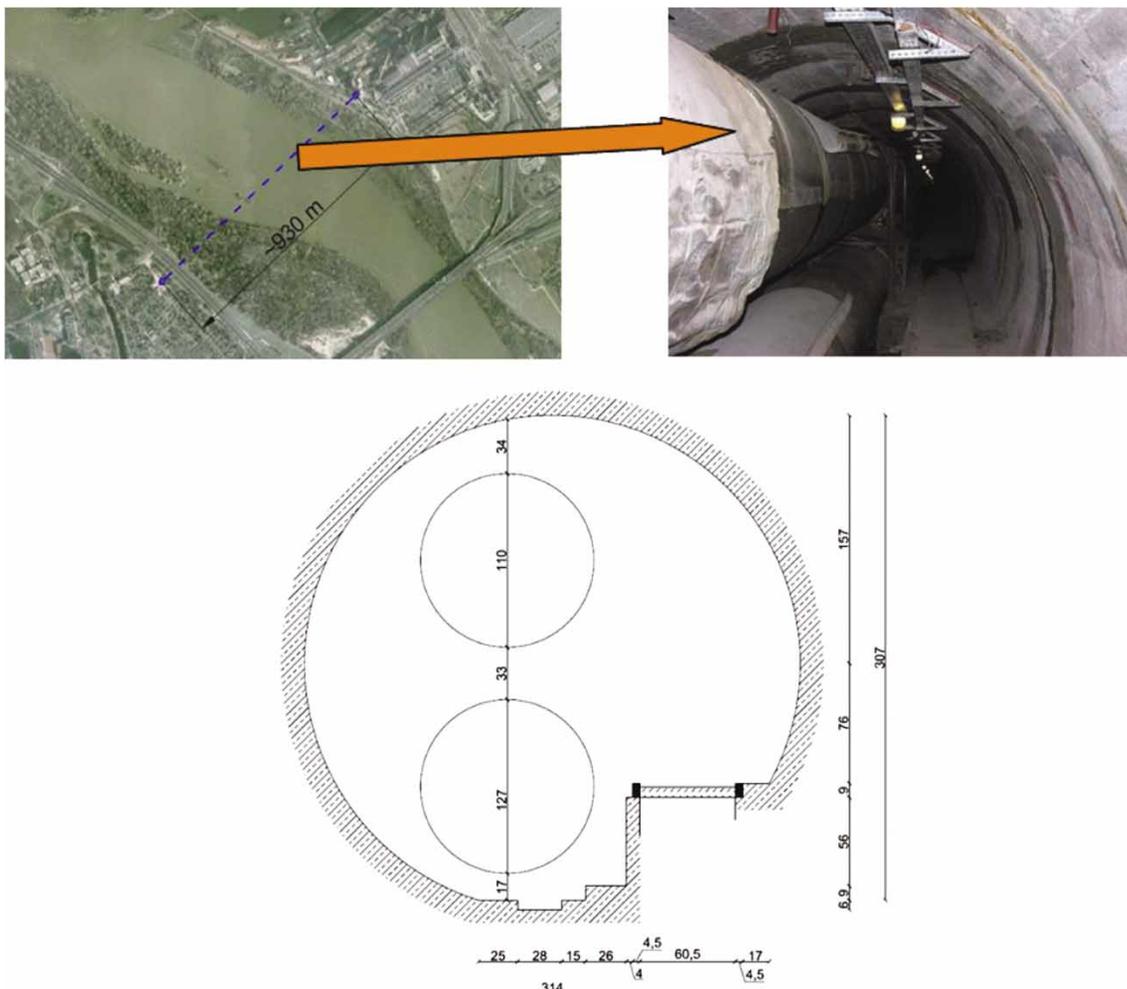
Location, general view and cross section of tested tunnel under river (Gorzelańczyk *et al.* 2012b)
